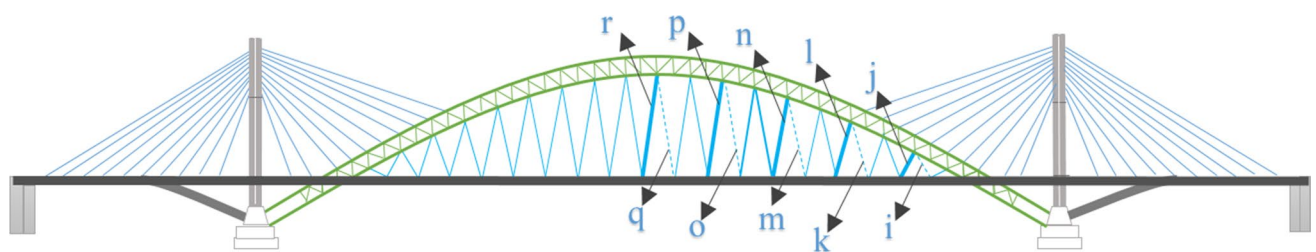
The cable-stayed arch bridge with inclined hangers with typical locations of overstressed hangers
